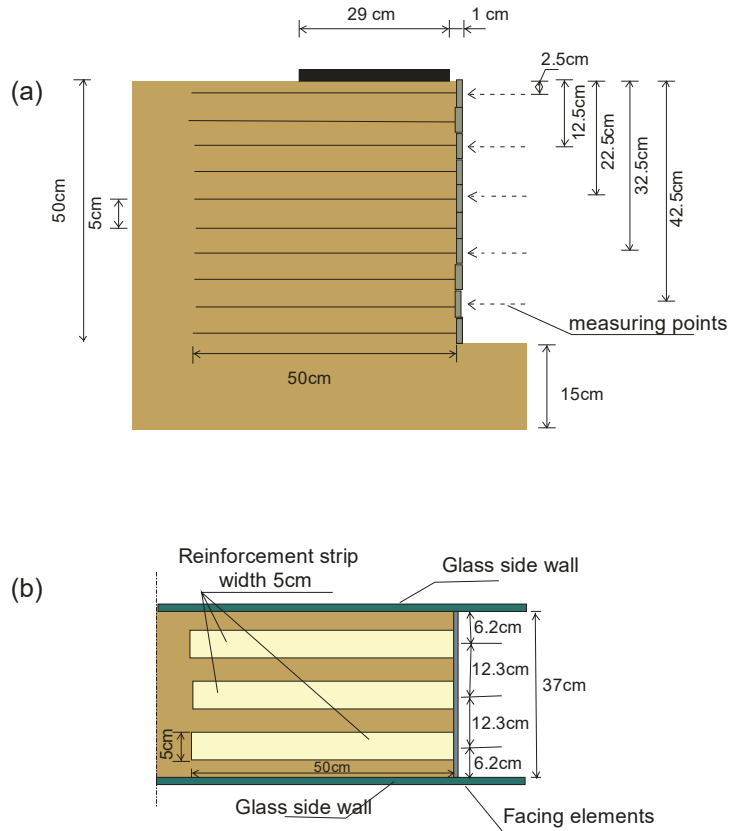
Cross-section of the RS model (a); layout of reinforcing strips (b).
